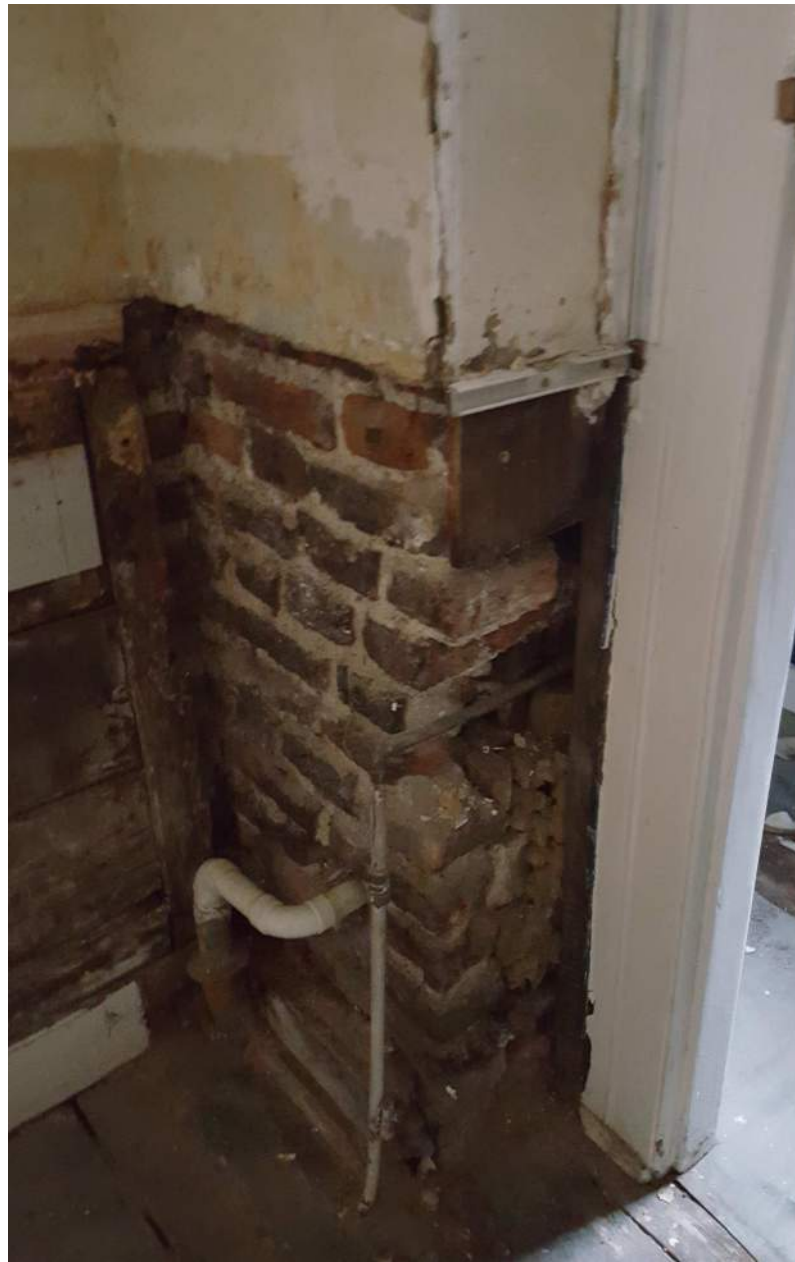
, Typical Masonry Reveal Repair - First Floor Half Landing Shown
